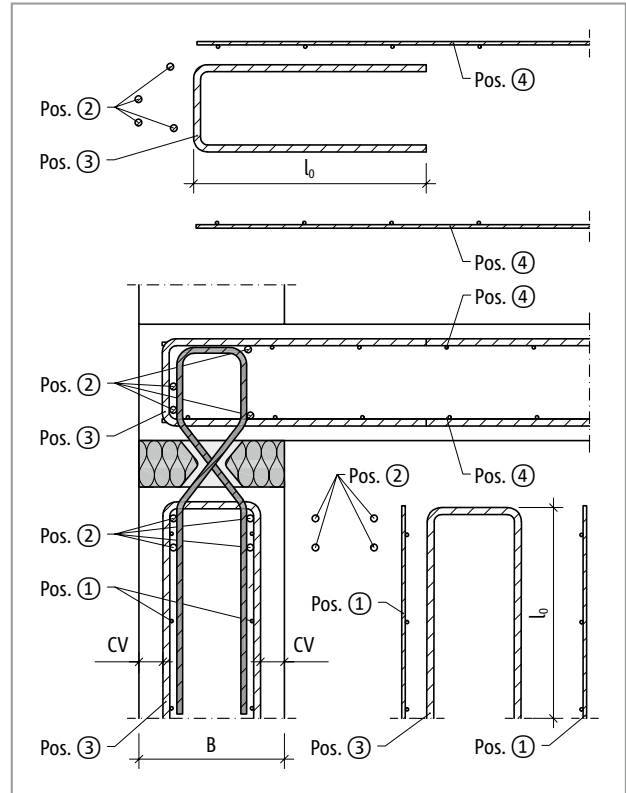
Schöck Sconnex® type W-N-VH: Variant A – on-site reinforcement for connection at top of wall
